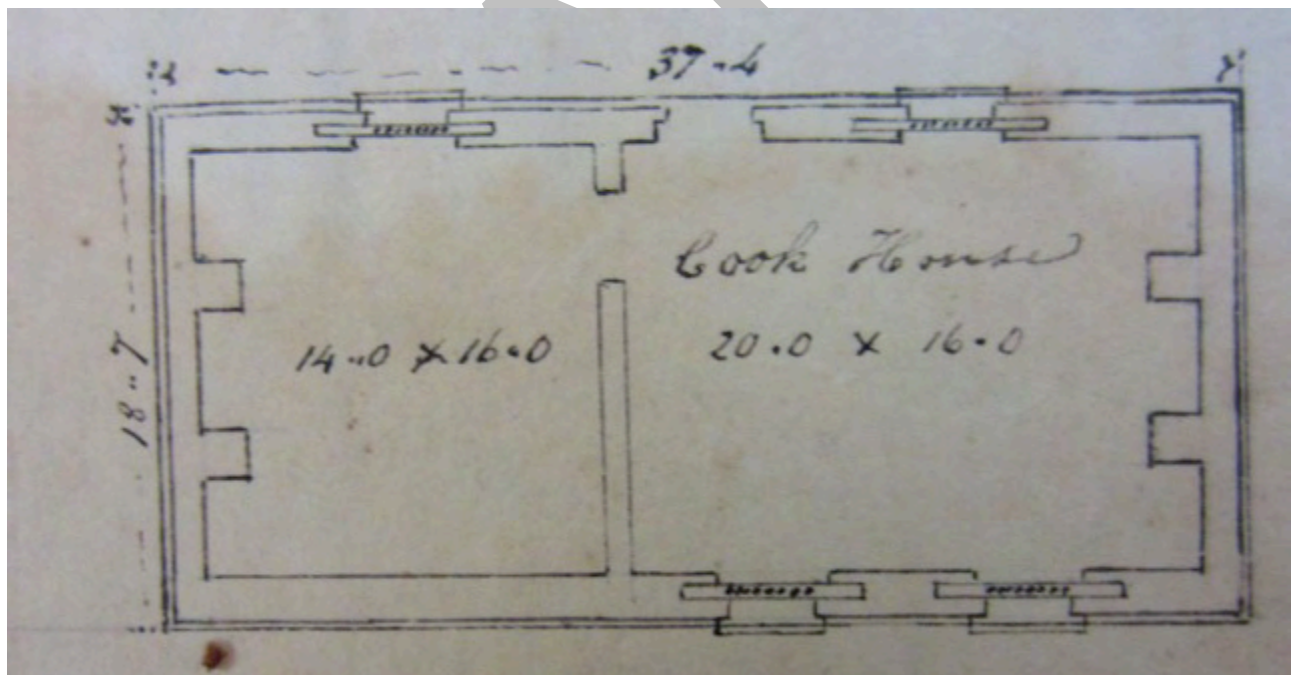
Cookhouse detail. Plan of layout mid 1845.
